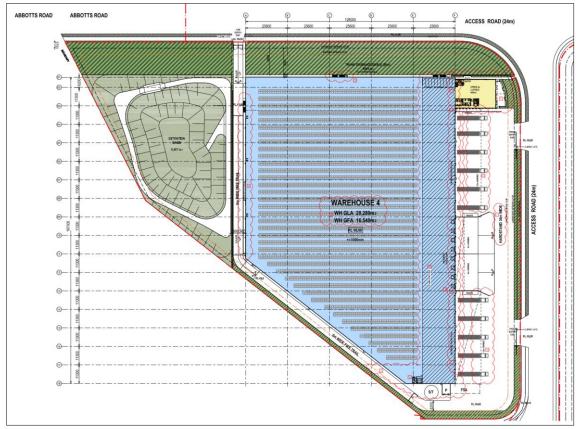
Approved Scheme Site Plan – Lot 3 (Previously Lot 4)
